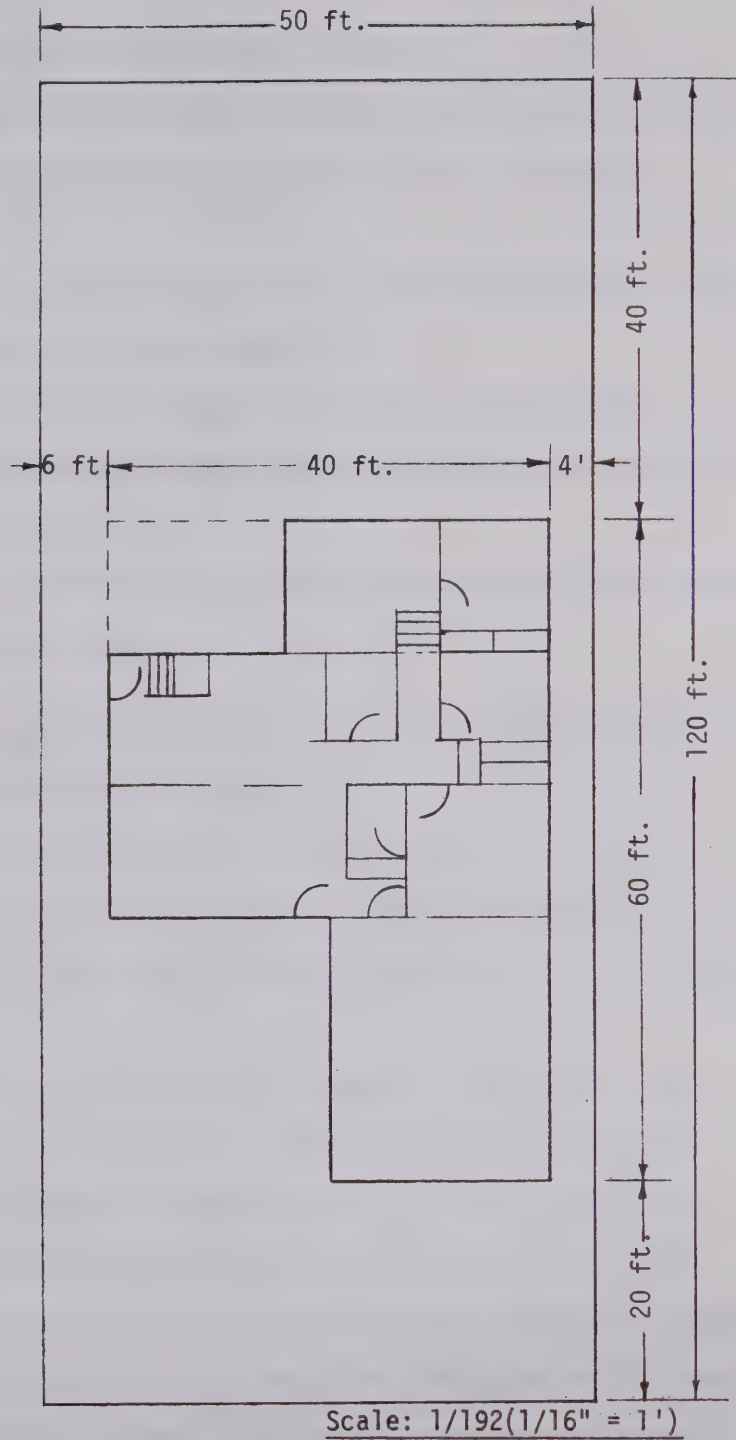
1248 square feet Three bedroom floor plan, patio, and double garage on the 6,000 square foot lot
